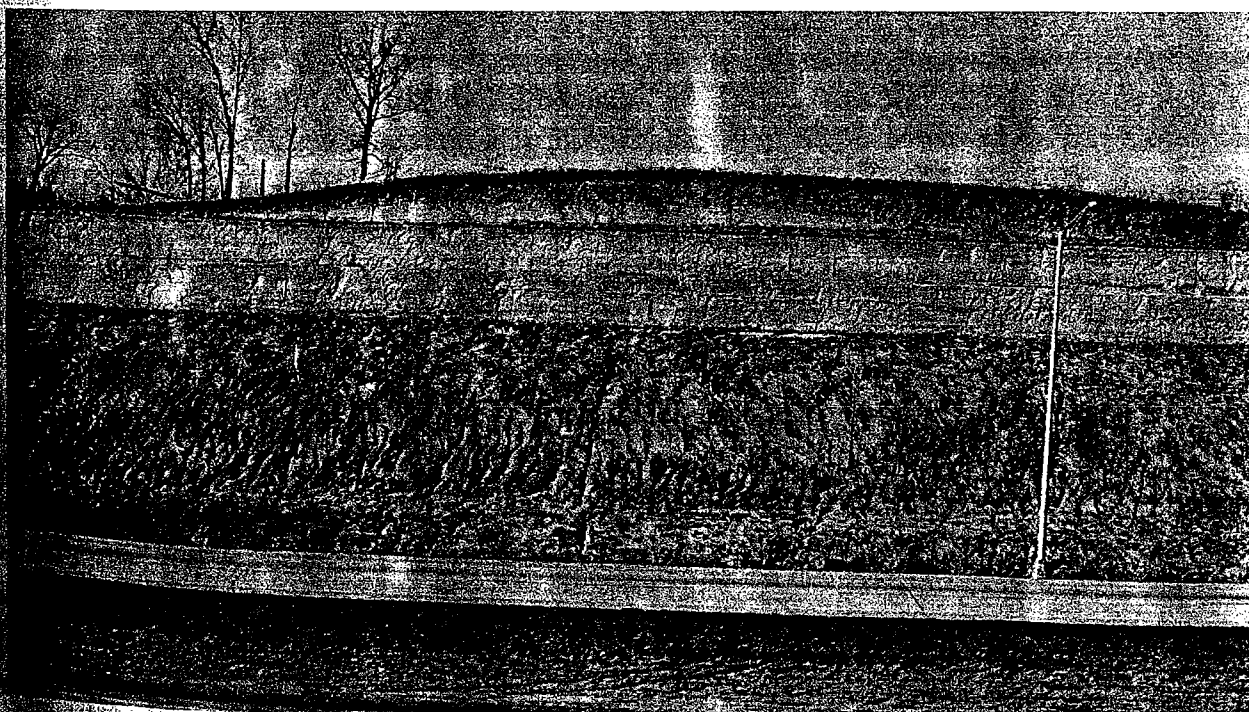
EXISTING SOUTH FACING SLOPE ON I-270 CUT.
